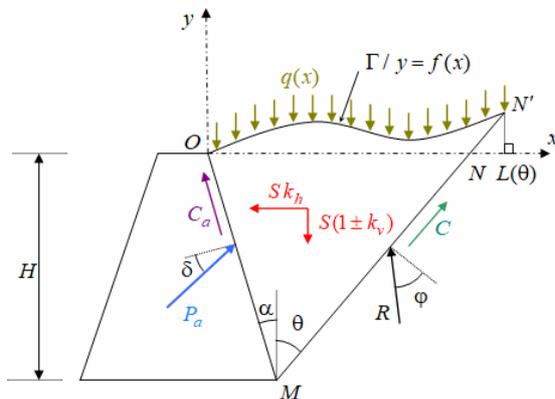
Retaining wall and backfill soil wedge system with representation of all the acting forces.
